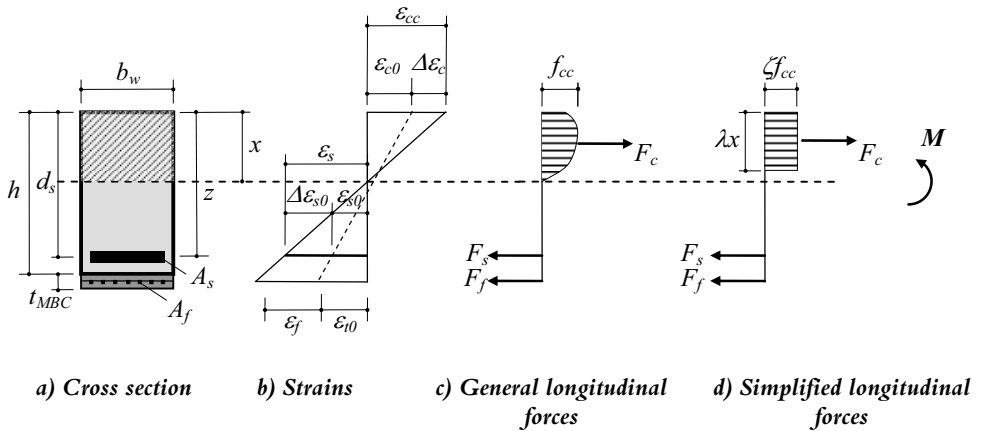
Stress-strain relationship for a tensile reinforced concrete beam with rectangular cross section.
